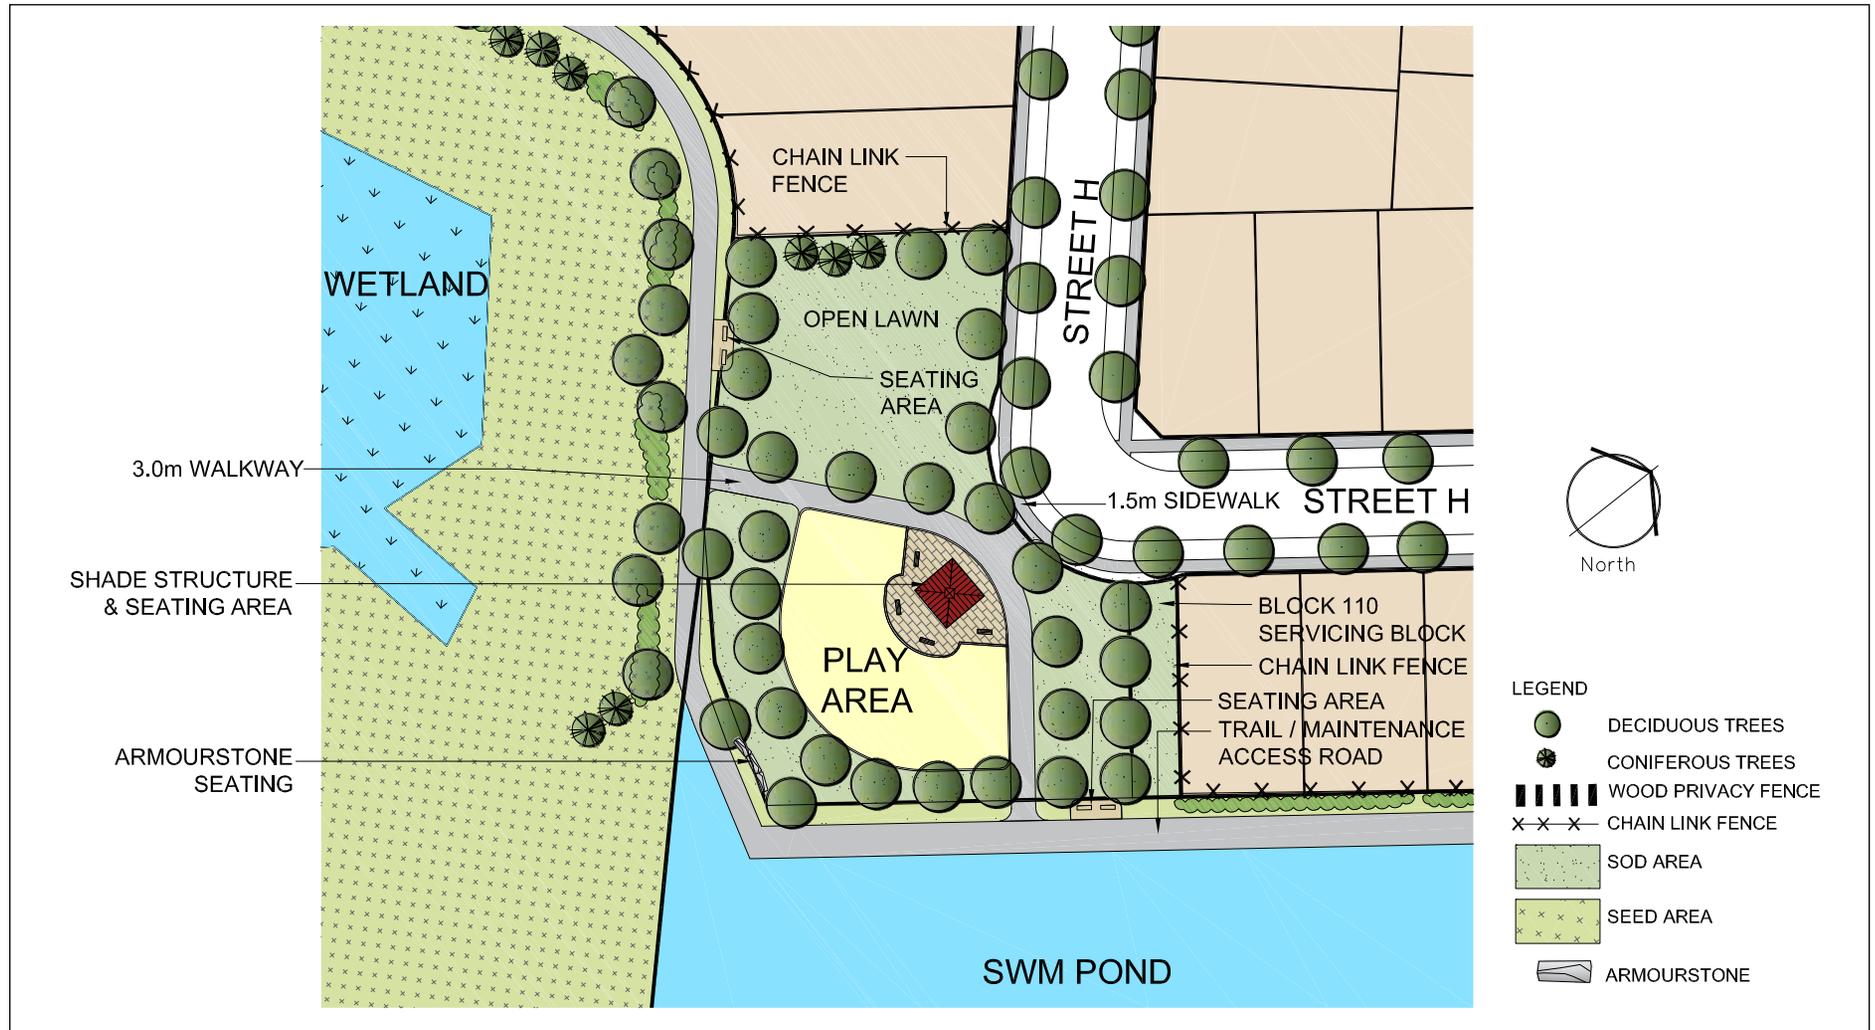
Conceptual Facility Fit Plan for the Village Square
